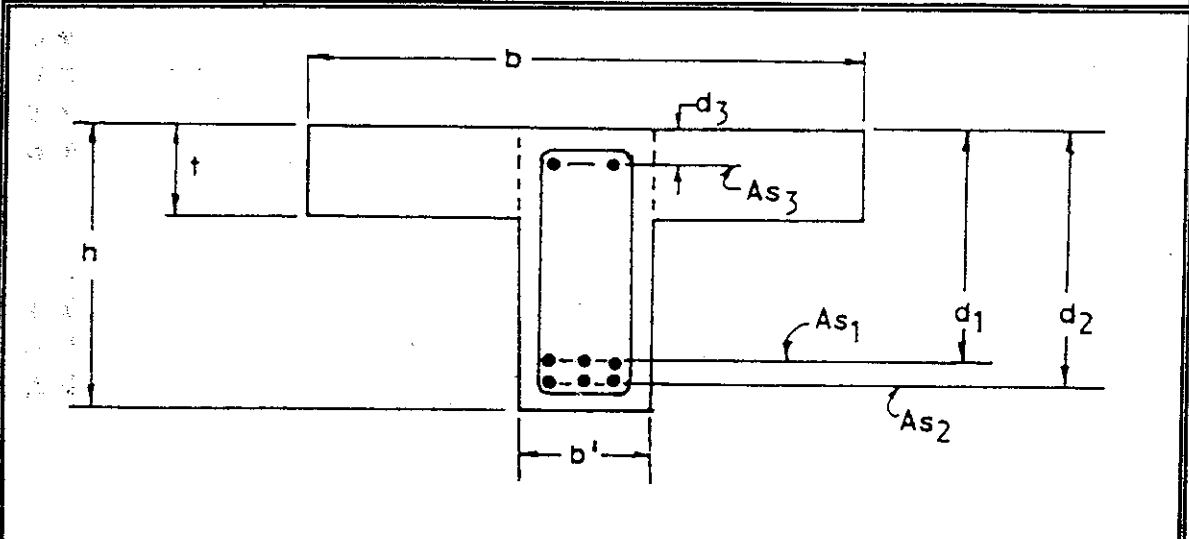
shows a sketch of a typical reinforced concrete T-beam with both tensile and compressive reinforcing steel. Under the sketch is the general formulation used in the calculation of section properties for reinforced concrete. Figure 11 shows the additional formulation used to calculate the constant j in the most general case (i.e., T-beam with compressive reinforcement).
